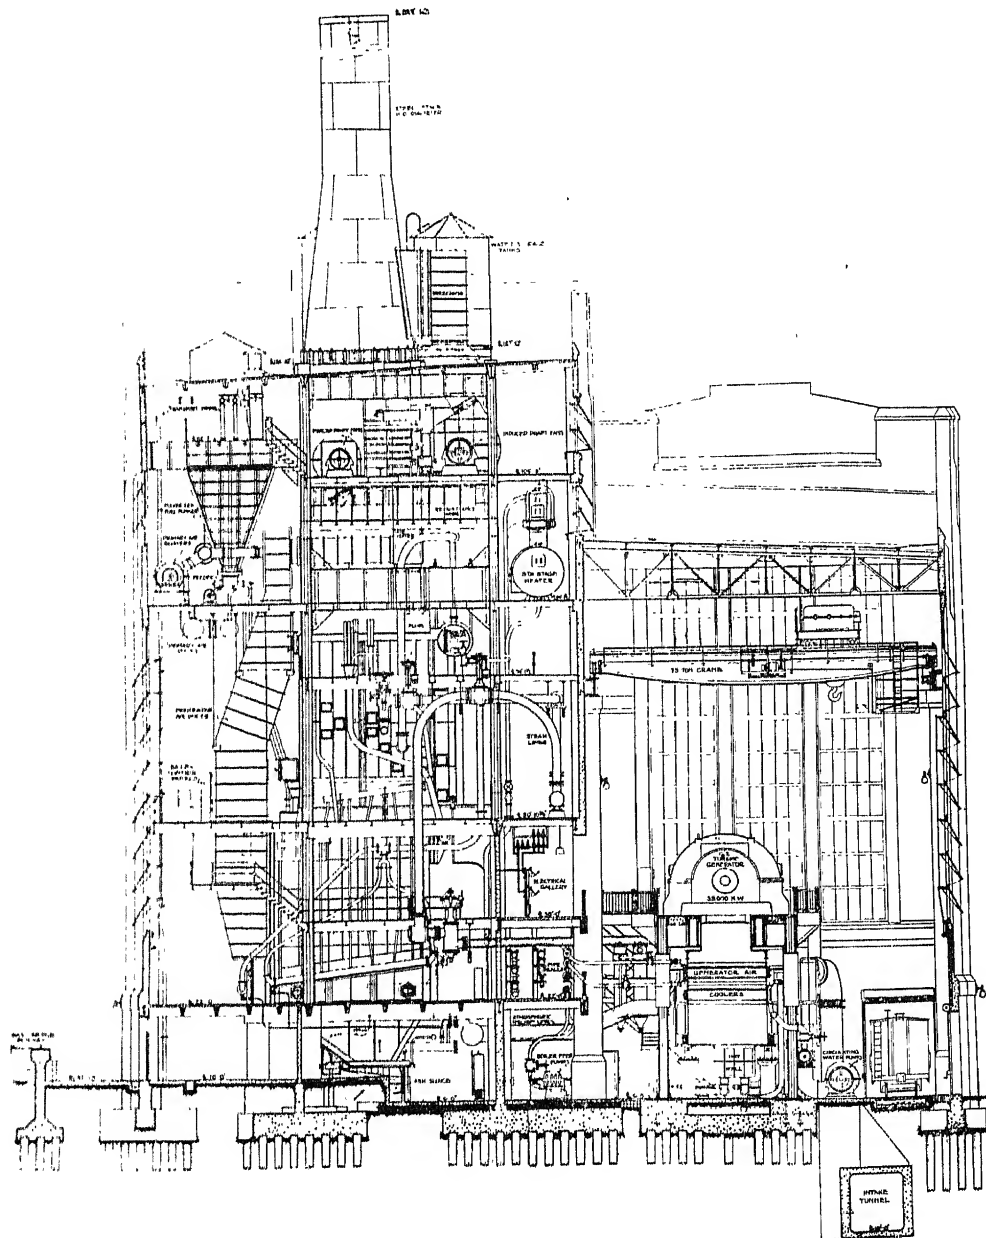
CROSS-SECTION OF TURBINE ROOM AND BOILER HOUSE
